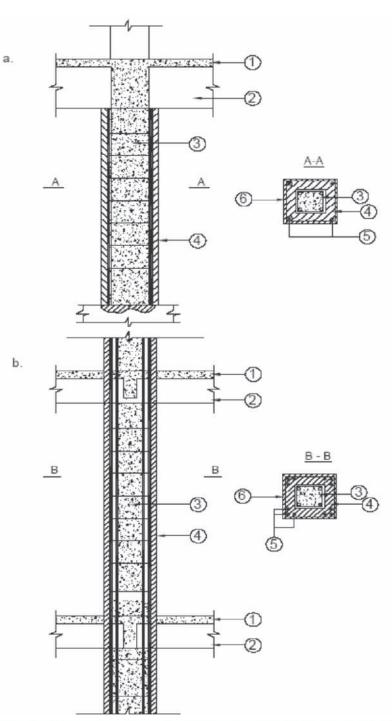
Repair of concrete columns by (a) local and (b) Global jacketing (1. Slab; 2. Beam; 3. Existing column; 4. Jacket; 5. Added longitudinal reinforcement; 6. Added ties)
